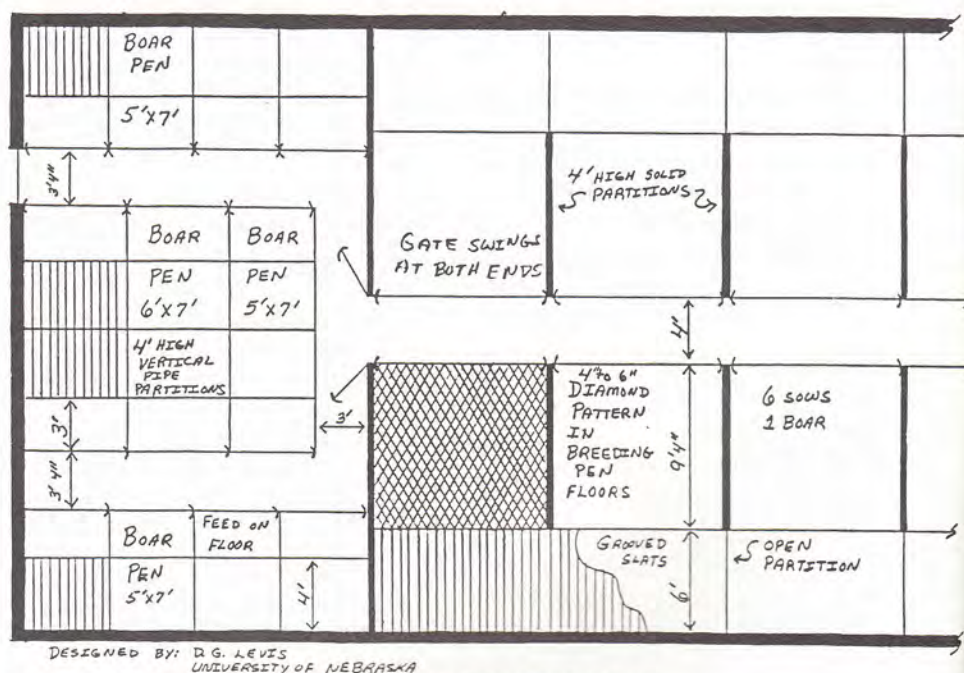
Modified Open Front (Gable Roof) Pen Breeding Facility.
